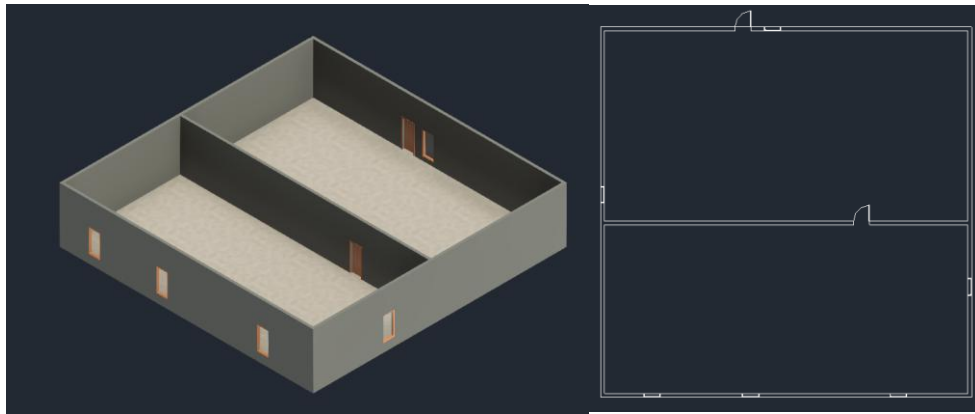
3D view and ground floor of the BIM model. Source: own elaboration
